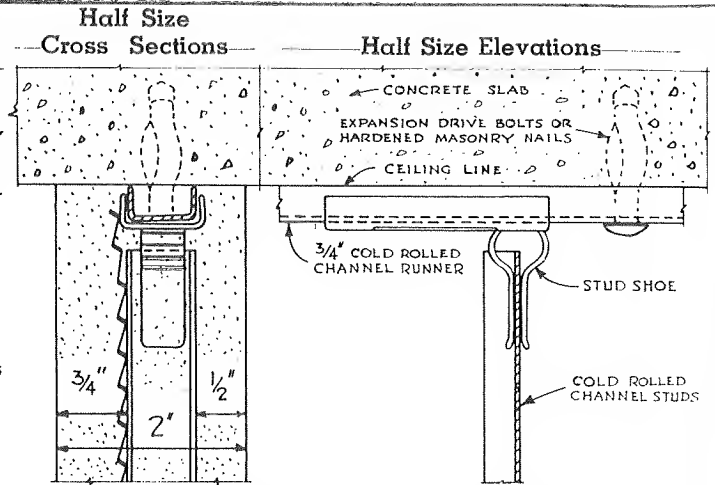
STUD SHOE SYSTEM—3/4-inch channel runners are attached to floor and ceiling with Rawl Drives. Special stud shoes clamp with a driving fit onto runners, and are placed to correspond with stud spacing. Studs are slipped into floor shoes or clips and top end then sprung into position in ceiling clips.
